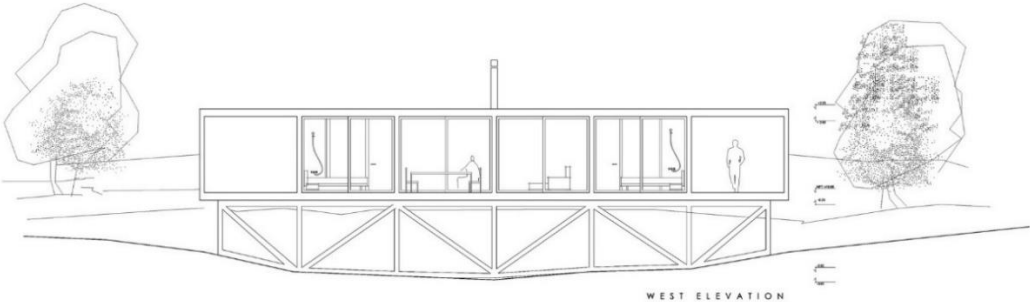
Product design - Outline West Elevation; Source: WMR Architects
